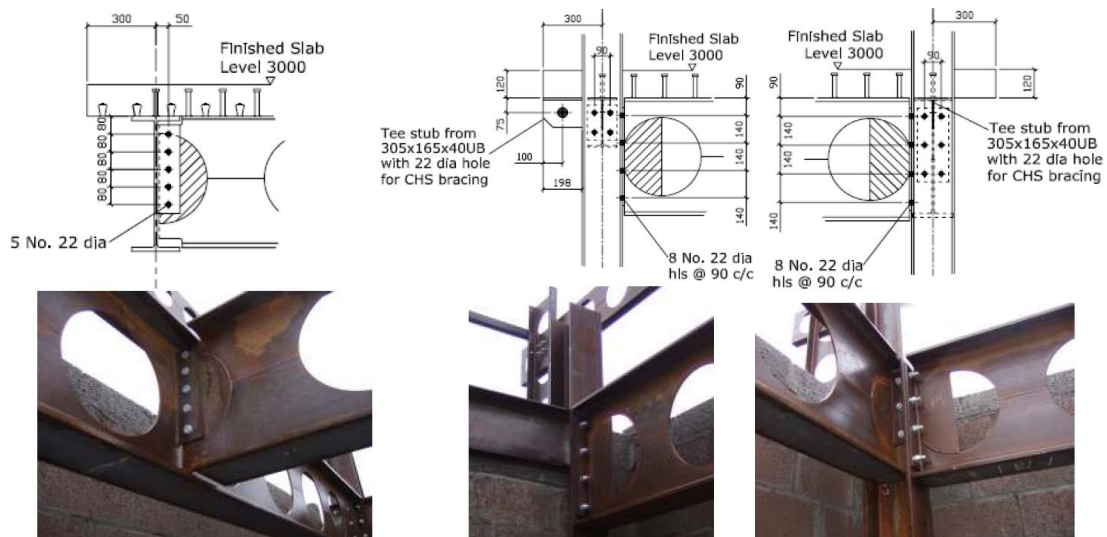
Beam-beam and beam-column connections (MACS+, RFCS, 2014)
